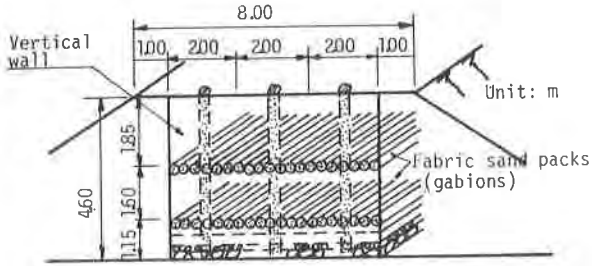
Front view of gabions placed in backfill behind vertical wall of cantilever retaining wall.
